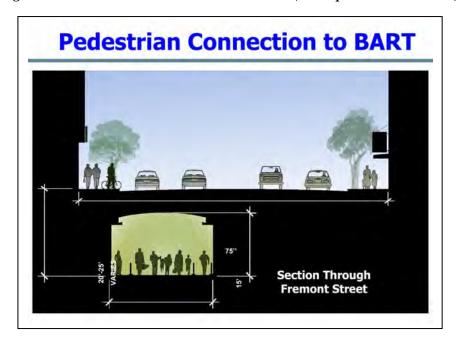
Pedestrian Connection to BART (Conceptual Cross Section)
